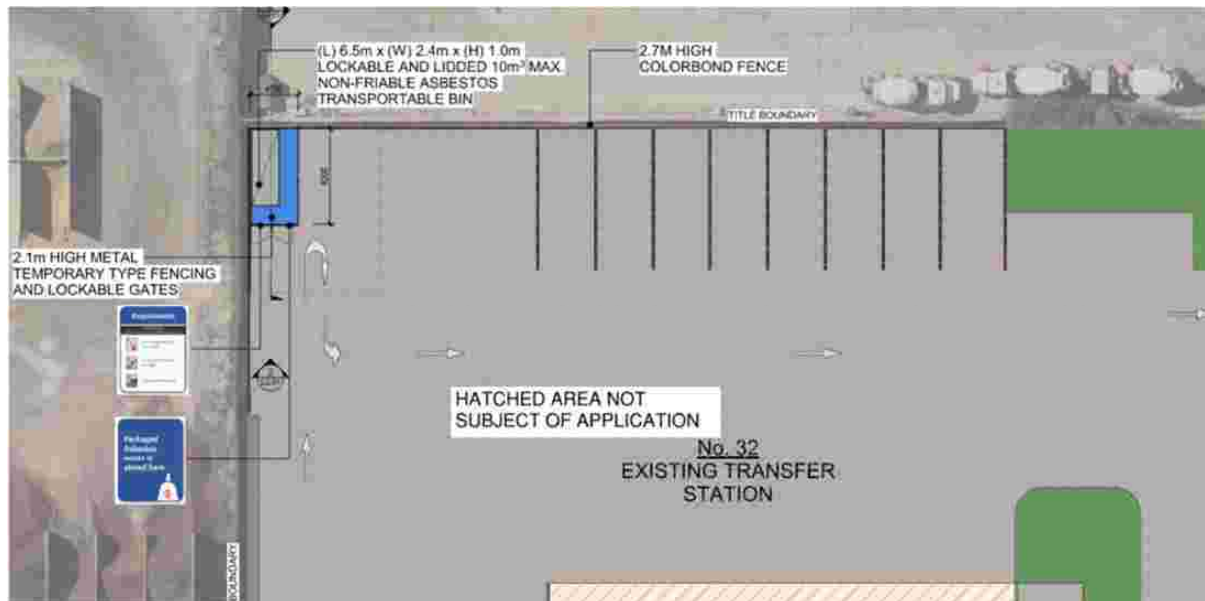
Extract from Proposed Site Plan showing only the ADP area for endorsement Ref - 12840 LU-01A
